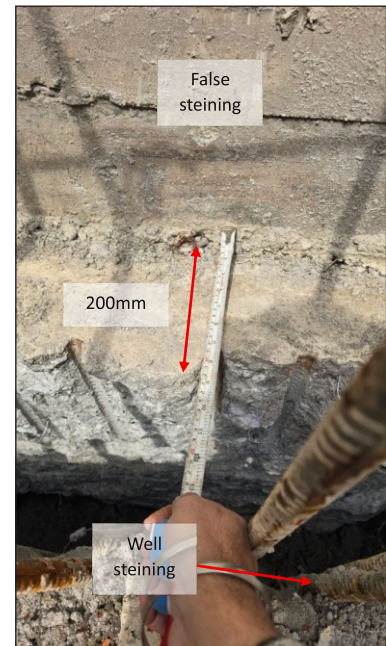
Cover to outer vertical bars of well steining is 200 mm instead of 75mm
